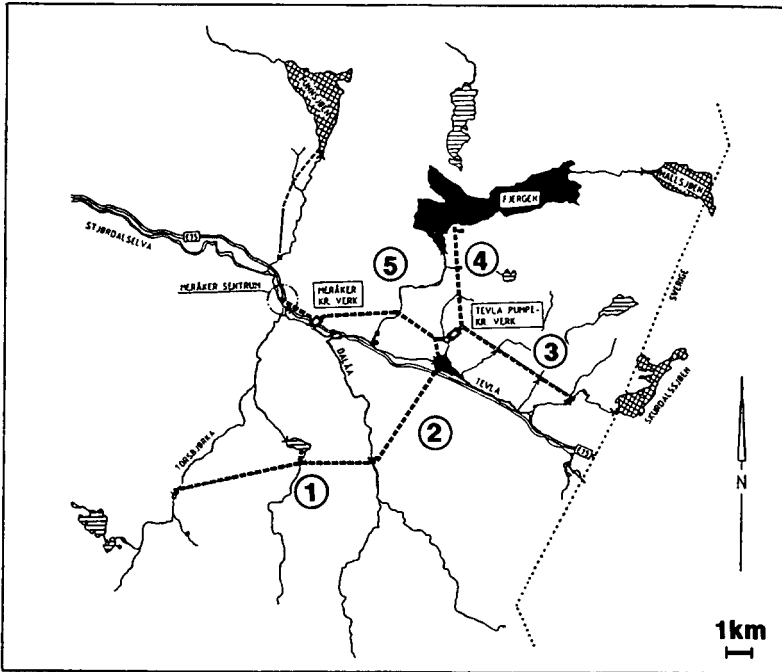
Plan of the Meråker Hydropower Scheme. Dotted lines are tunnels, rectangles power stations and shaded areas lakes.
